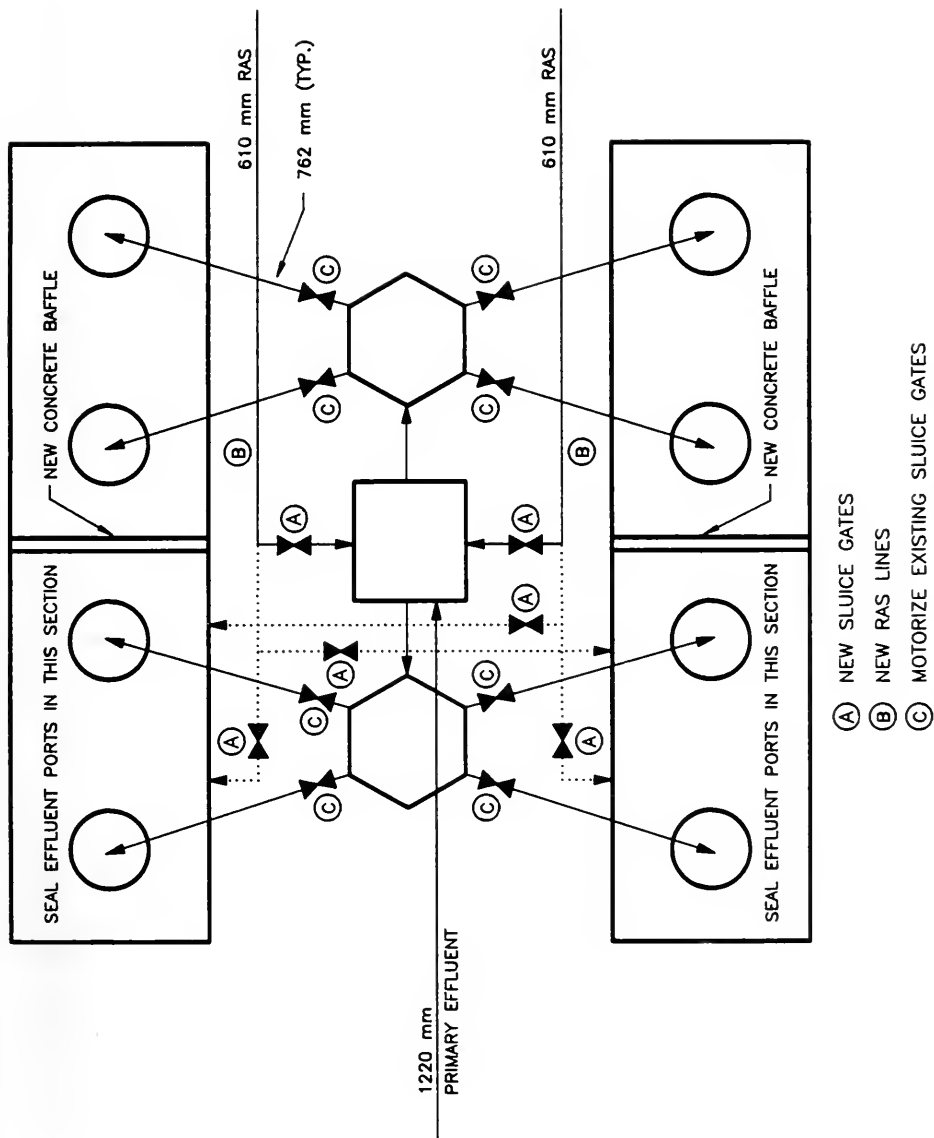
Port Dalhousie Plant Step Feed Modifications
